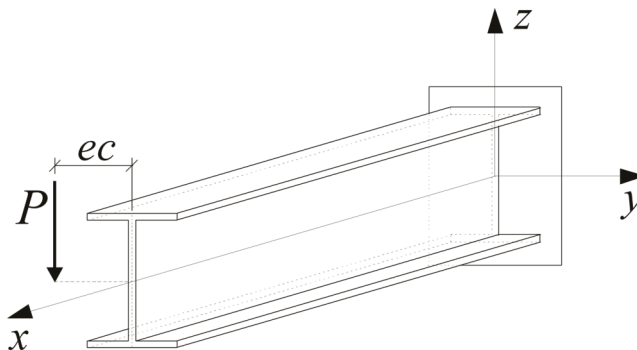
The case of bent and twisted I-section cantilever thin-walled beam
